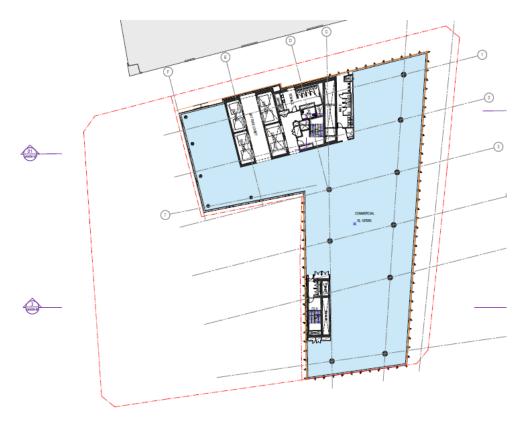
Proposed Levels 42-53 - typical sky-rise commercial office floor plate
